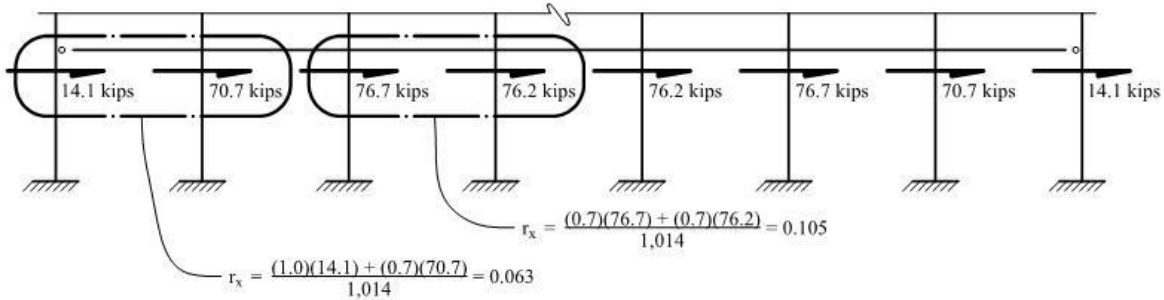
Column shears for E-W direction (partial elevation, Level 2) (1.0 kip = 4.45 kN).
